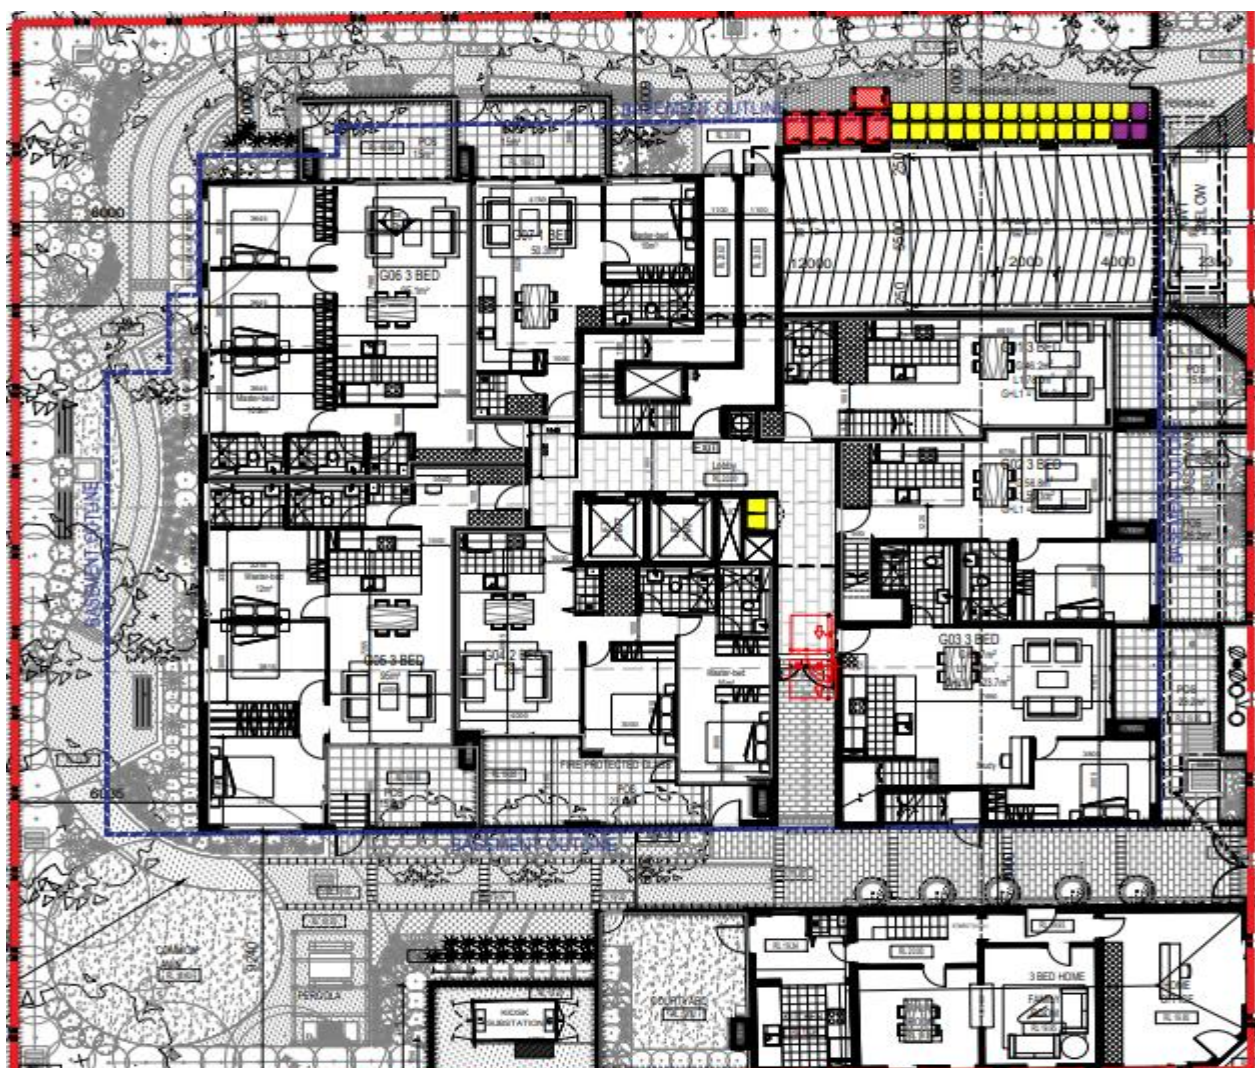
Extract of applicants submitted Ground Floor Plan.
